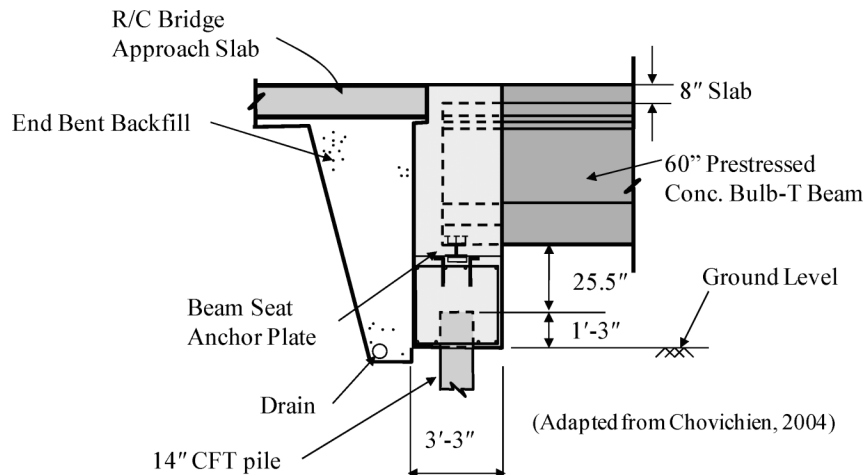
Typical Cross-section of Abutment for SR-18 over The Mississinewa River
